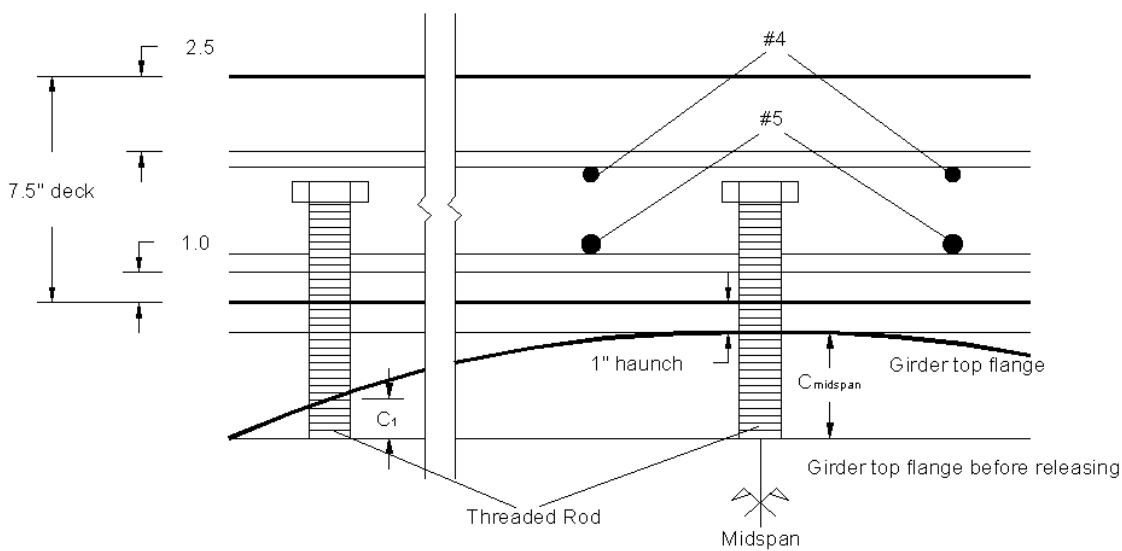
Steel Layout in the Deck around Vertical TR
